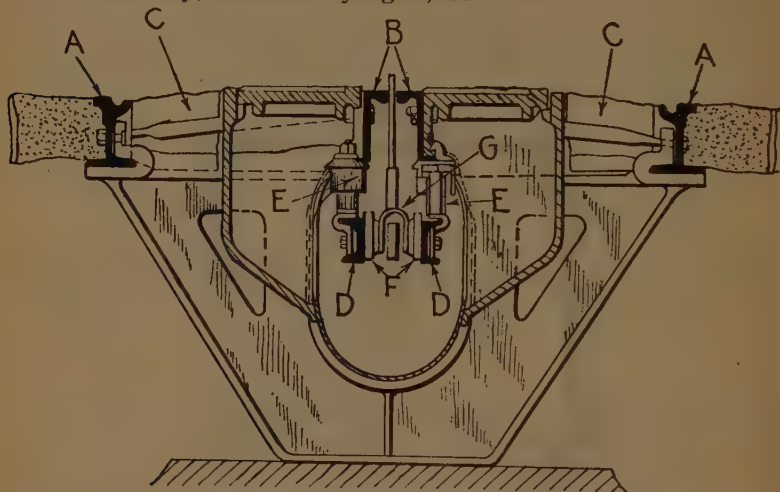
,693.—Yoke construction for conduit or underground trolley, as installed on Metropolitan Railways, New York City. These yokes were placed 5 feet apart in an excavation made through the street. The track rails A, A, and the slot rails B, B, were then laid on the yokes, and the ties C, C, inserted. The whole structure was then blocked up, surfaced and lined, and constituted the track construction. The conductors consist of two channel beams, D, D, placed 6 inches apart and supported by insulators E, E, at each yoke. The contact rail joints are bonded in a manner somewhat similar to ordinary rail bonding, and from a complete metallic circuit having a pressure of 500 volts between the conductors. The current from these conductors passes through the slot or opening between the slot rails and extends into the conduit to a distance sufficient to bring the plow contacts or shoes F, against the conductors. The spring G, tends to keep the shoes normally about 8 inches apart, so that when they are pressed into the 6 inch space between the conductors, they maintain a firm sliding contact with the latter. The yokes used on some of the lines constructed later are practically the same, but T iron conductors are used instead of the channel beams. In order to provide of expansion and contraction the center of each section of rail is fastened solidly to an insulator at that point, and the ends of each rail are slotted and bonded with a flexible bond. Hand hole provided with iron covers are placed about 15 feet apart directly over the insulators. The manholes are placed about 150 feet apart, and usually between the tracks. Arrangements are made at these points to drain the conduit into the sewers. The bottom of the conduit is given a minimum grade of 2 inches to 100 feet, so as to insure proper drainage on sections of level track. The contact rails are treated like a double trolley wire, and the feeders and mains are laid in underground conduits. This system is so expensive to install that its use is limited to only a few of the largest cities where for various reasons the use of the overhead trolley is objectionable and prohibited.
